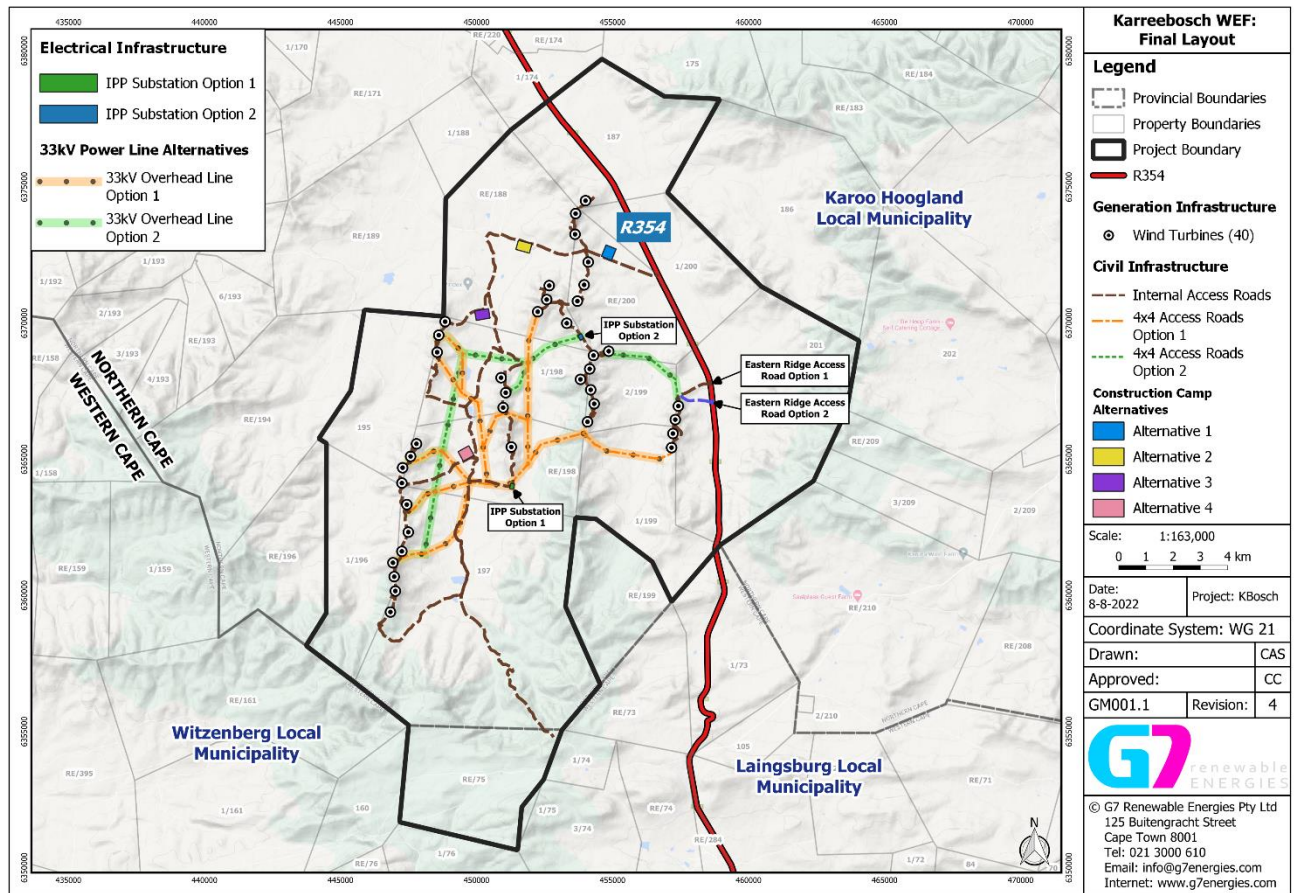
Part 2 Amendment - KB WEF Site Final Layout Plan (2022).
